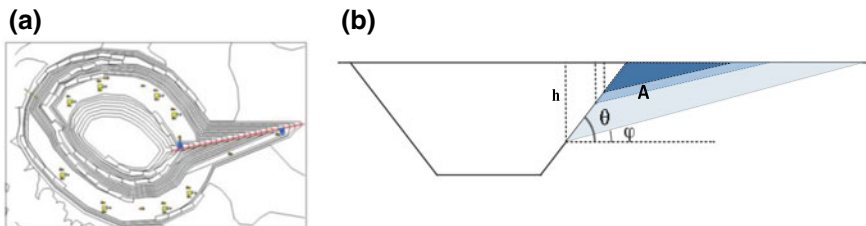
A general form of dedicated ramp slot, a plan view [6], b cross-sectional view
